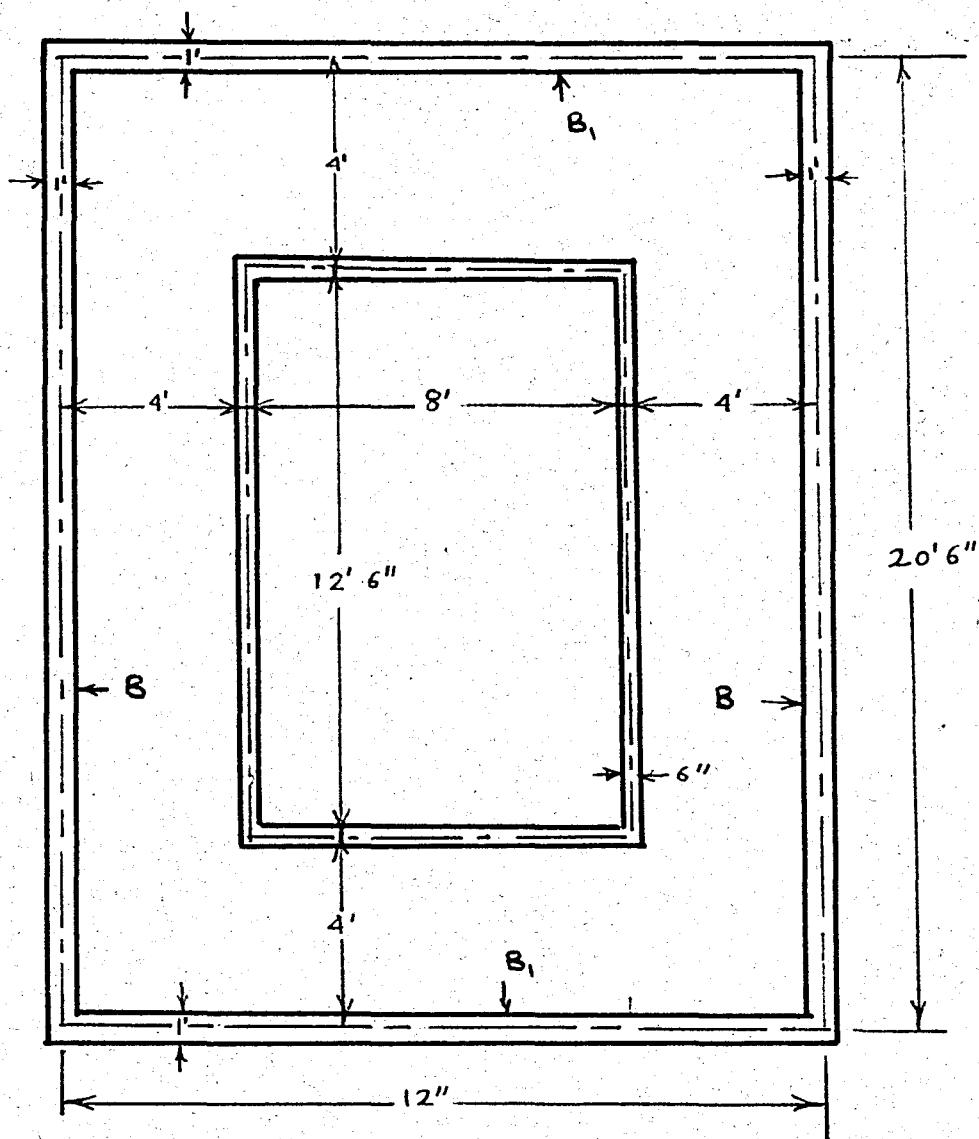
Plan of Supporting Beams of Top Slab of Stairway
